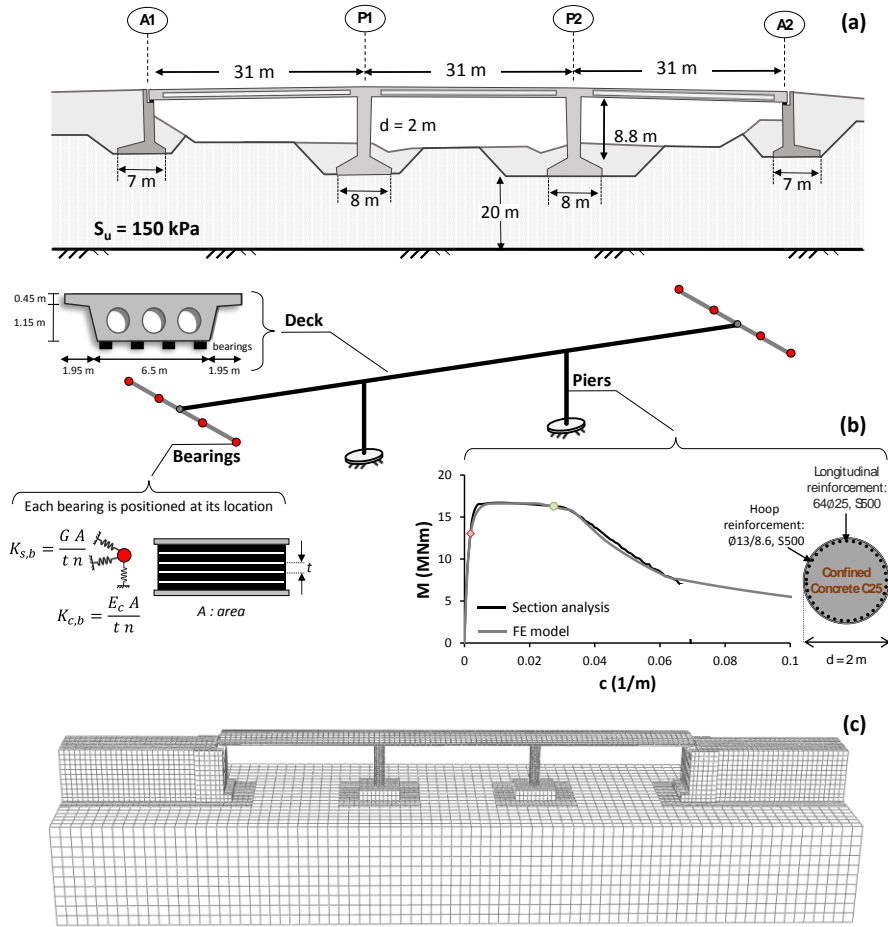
(a) Typical overpass bridge (A01-TE20) of the Attiki Odos motorway used as an example for the analyses (b) key attributes of the bridge and (c) full 3D model of the bridge, including the foundations, the abutments, and the subsoil.
